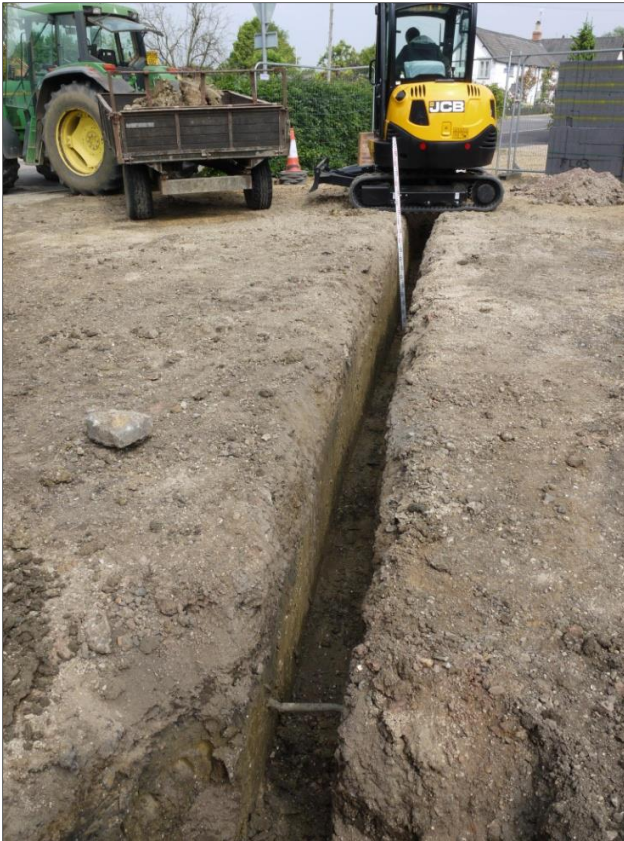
Overview of drainage trench to the northwest of the new building. Facing west
